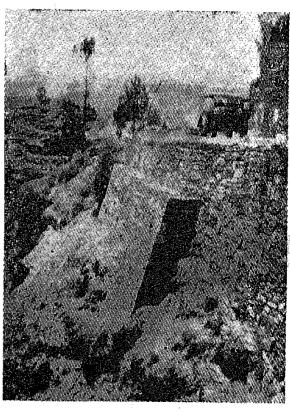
The wall in photo 4 after repairs. The voids were tightly packed with stones and a toe wall built for support
